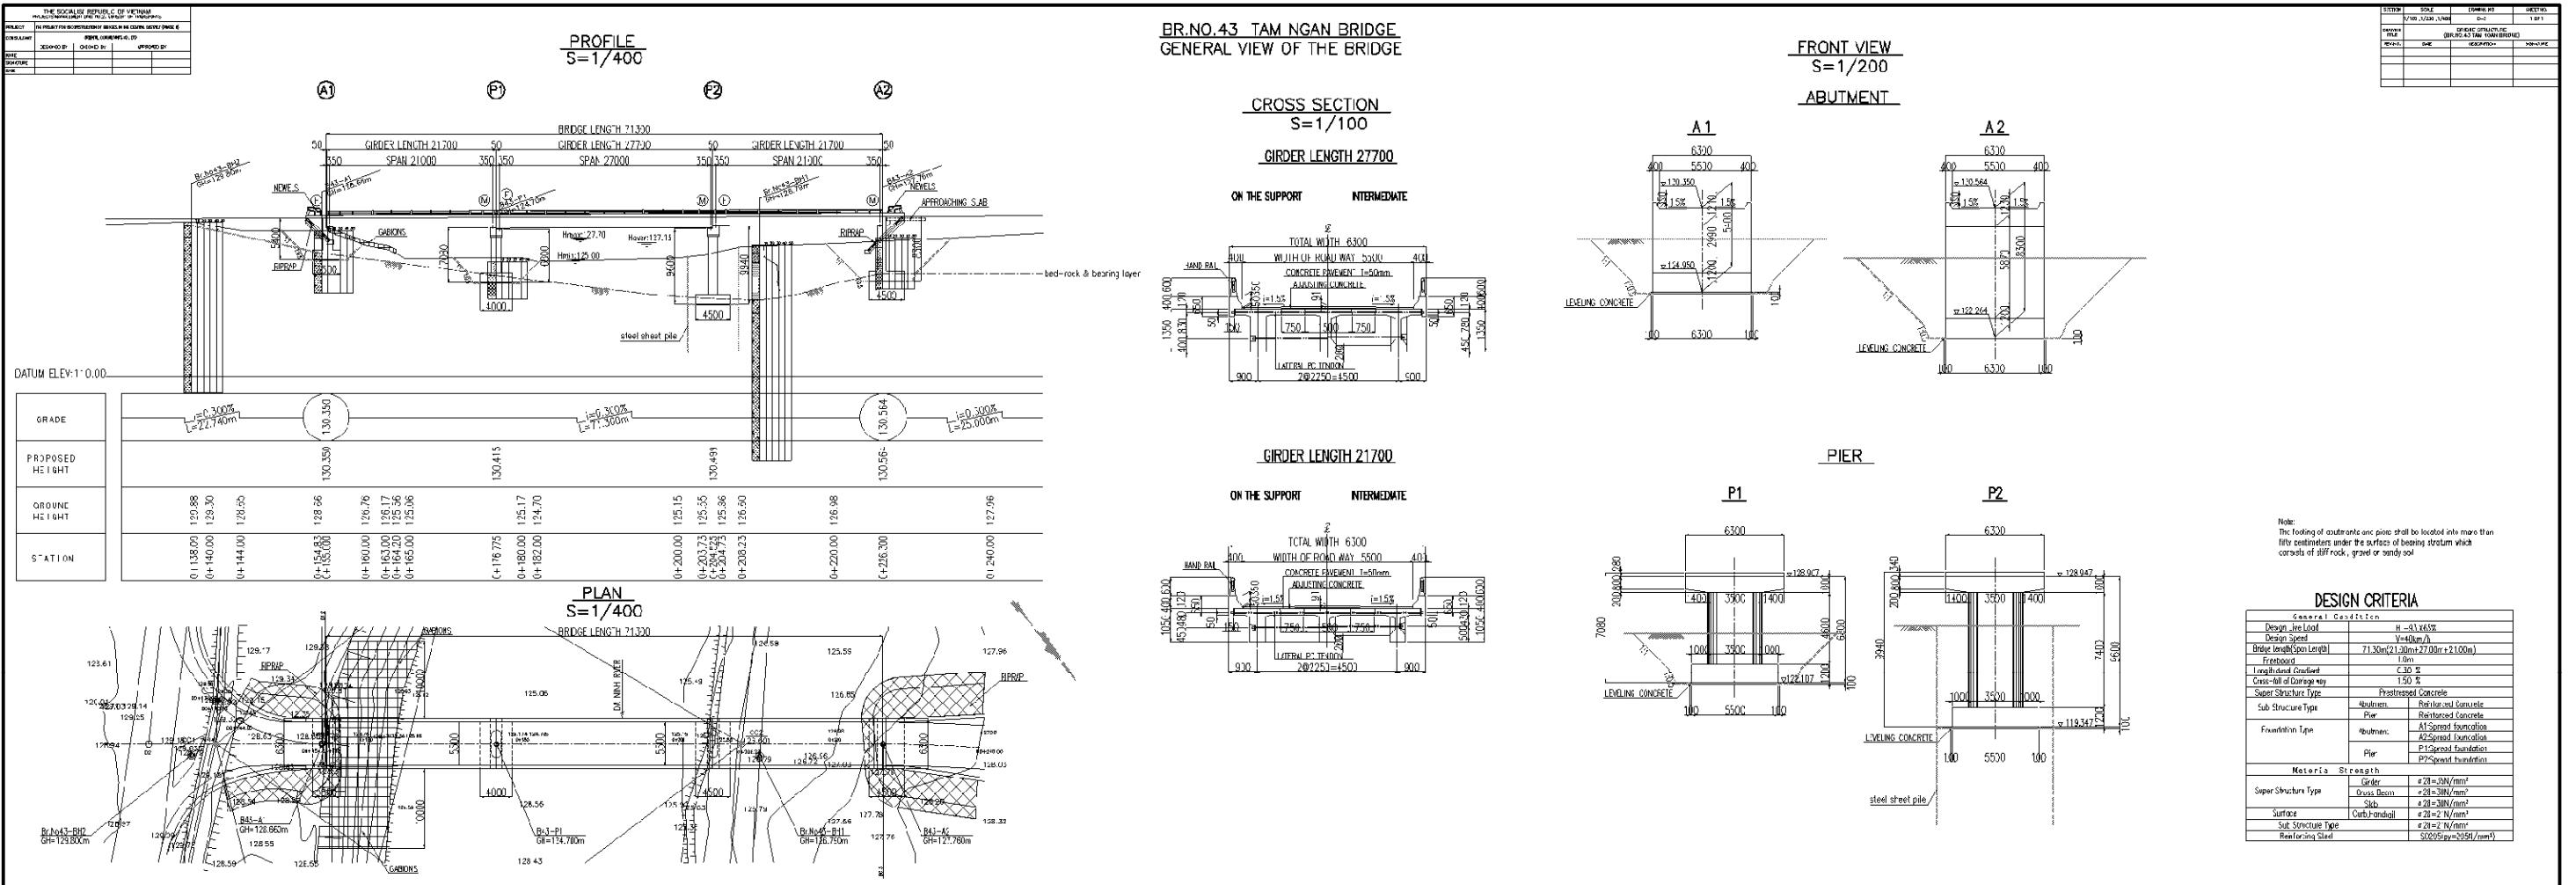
Tam Ngan Bridge (General View for Structure)
